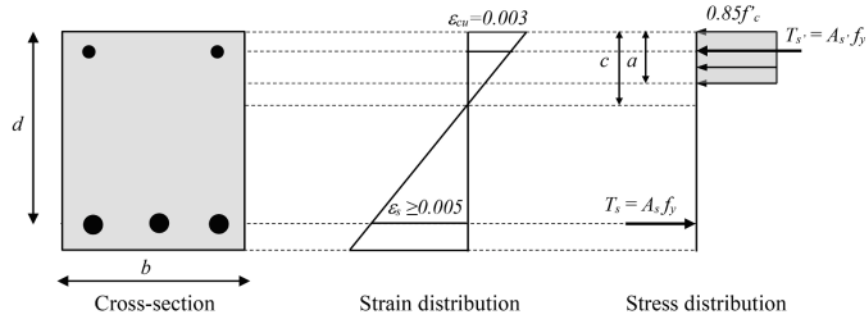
Strain-stress distributions of acting of PET waste RC beams section.
